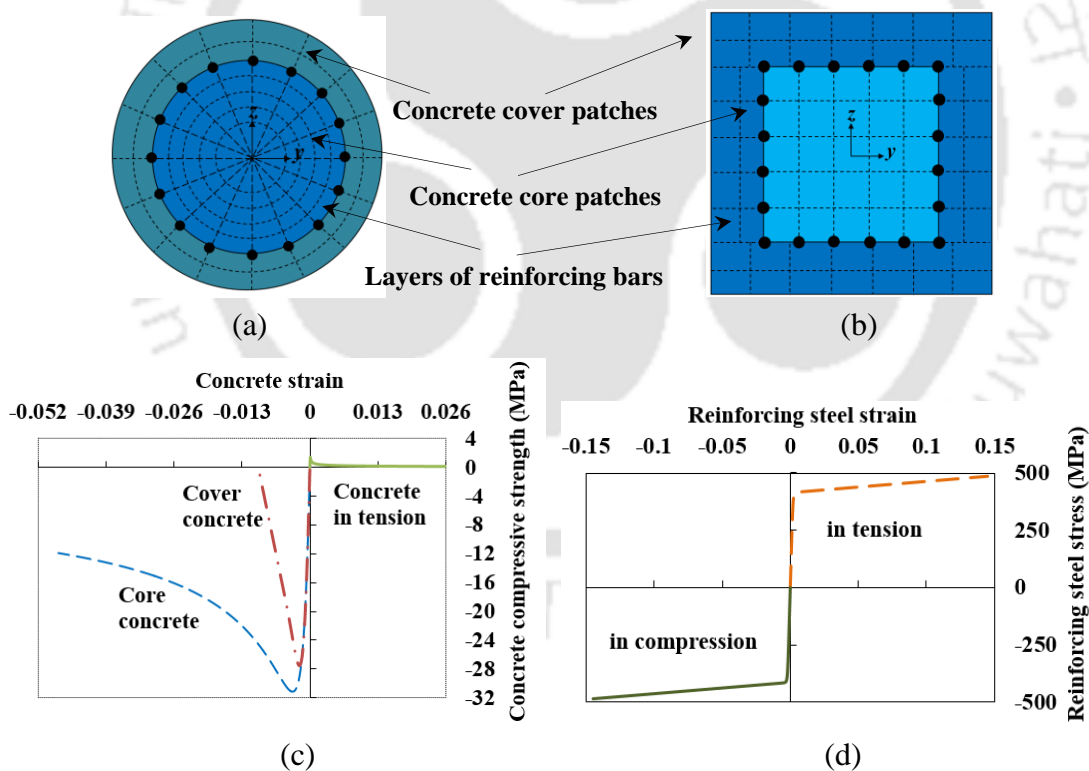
RC fiber section for (a) pier and (b) pile, and sample stress strain curves for (c) concrete and (d) reinforcing steel.
